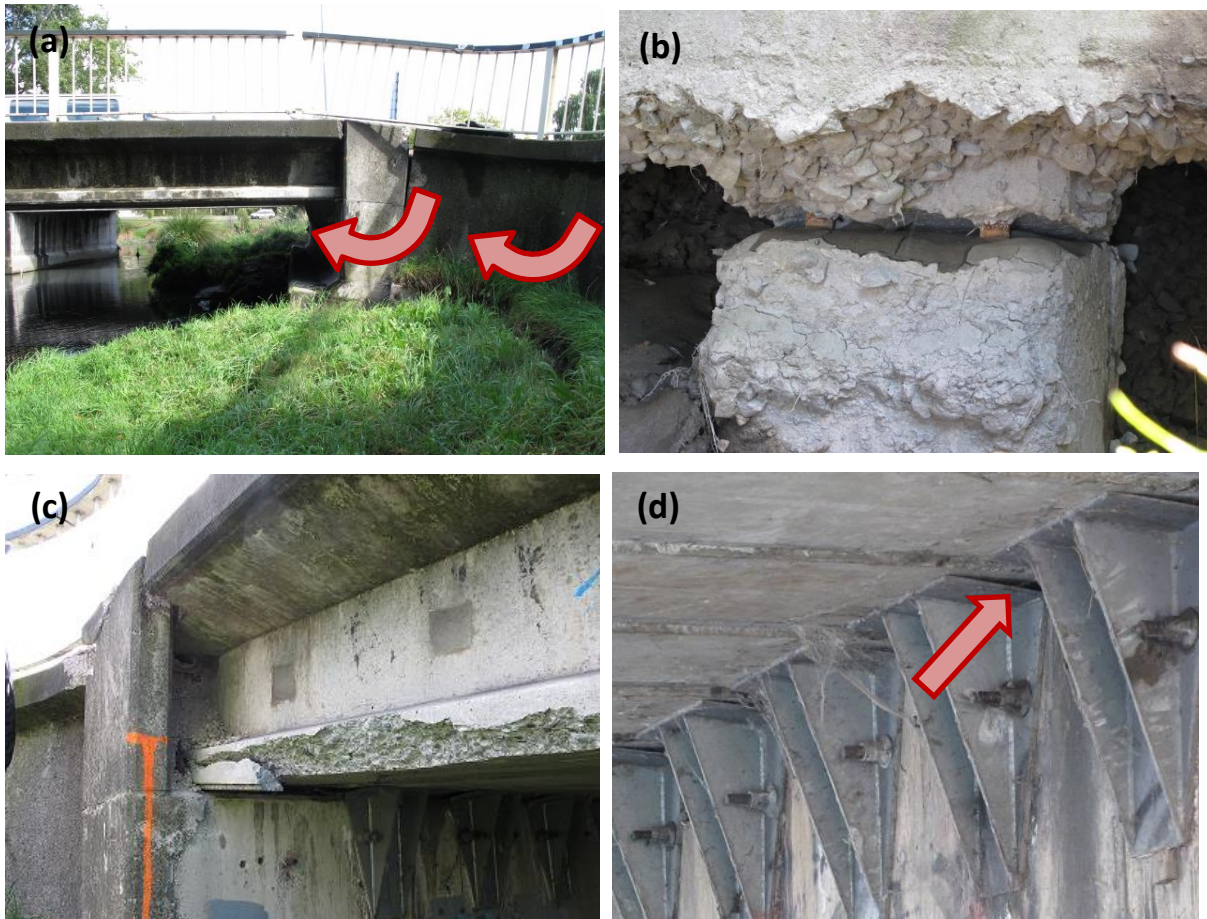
Fitzgerald Avenue eastern bridge north abutment, (a) abutment and wingwall back rotation, (b) tension failure of abutment pile, exposure of reinforcement, (c) spalling of bottom flange of deck girder, (d) gapping between steel brackets and bridge deck due to rotation of abutment
